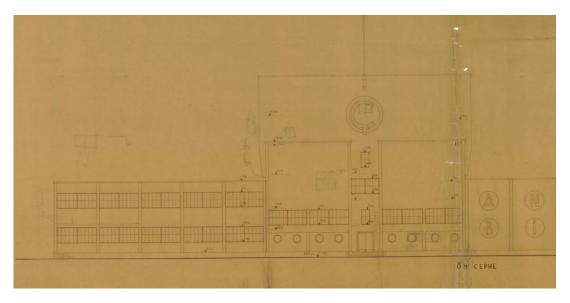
Original drawing of the boiling and fermentation building, the north elevation, Ernst Egli, 1937 (Source: TTA Archive)
